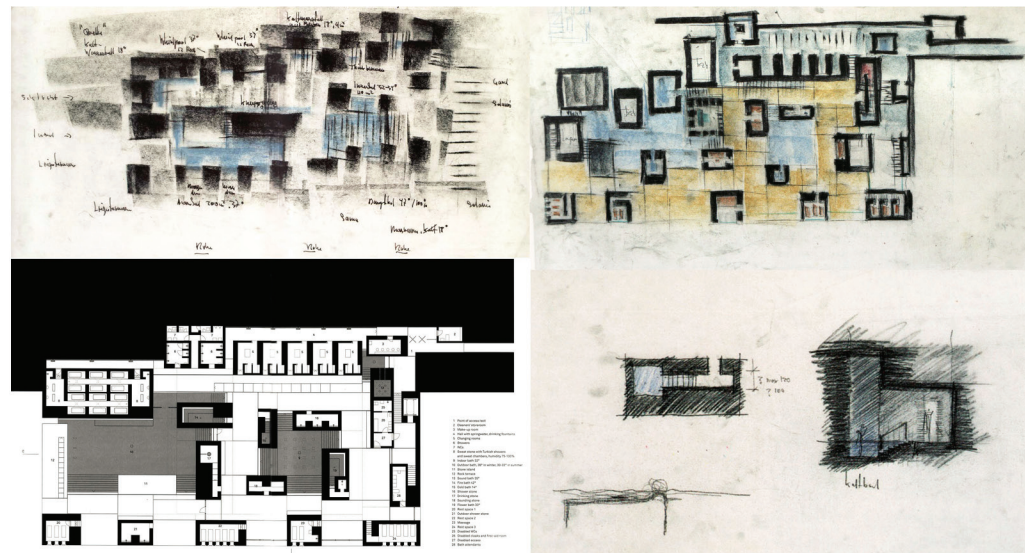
Peter Zumthor's earlier plan sketches of Therme Vals
